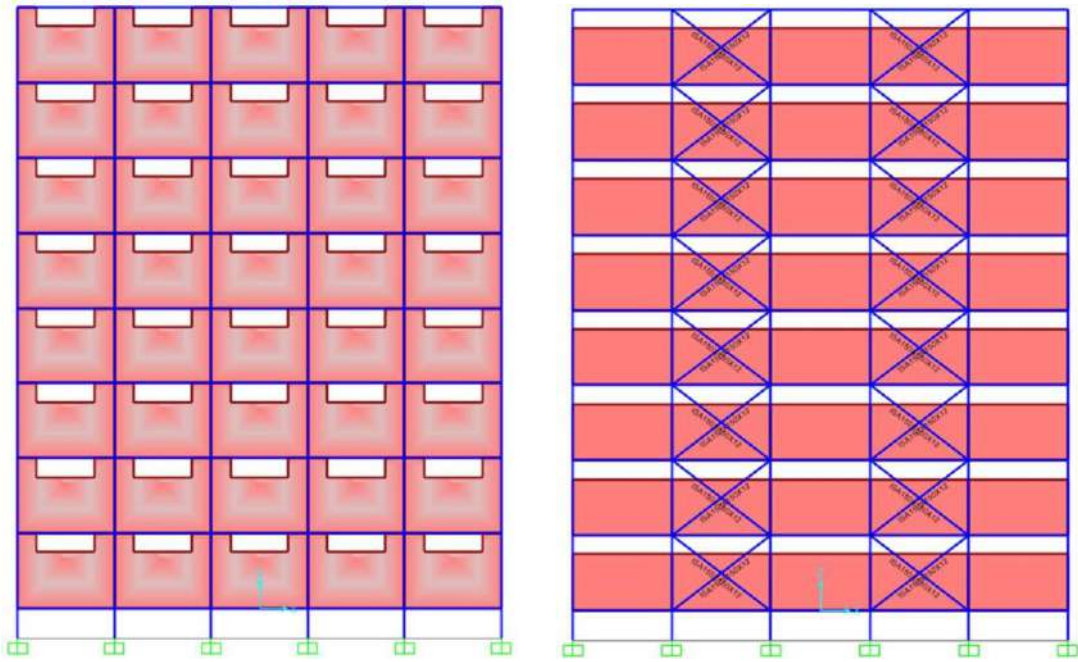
Elevation of 75% Partially in-filled frame with additional in-fills adjoining the column
